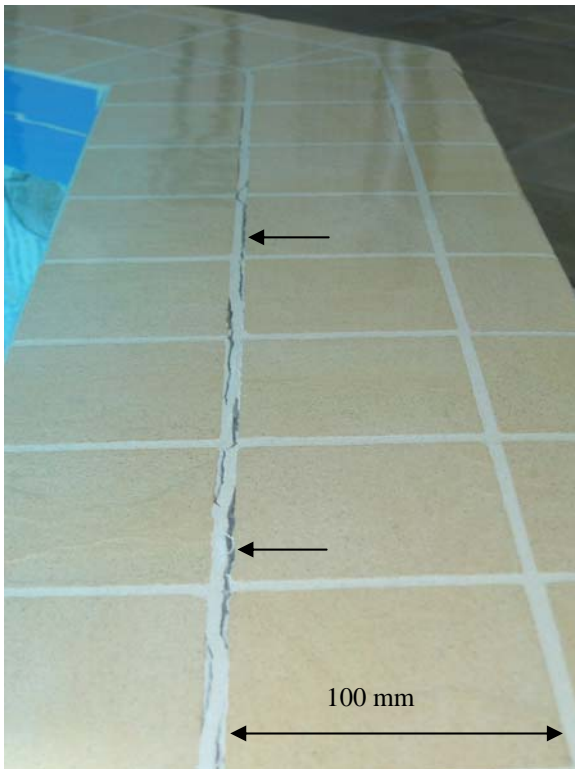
Longitudinal crack in the horizontal top surface of the wall.
